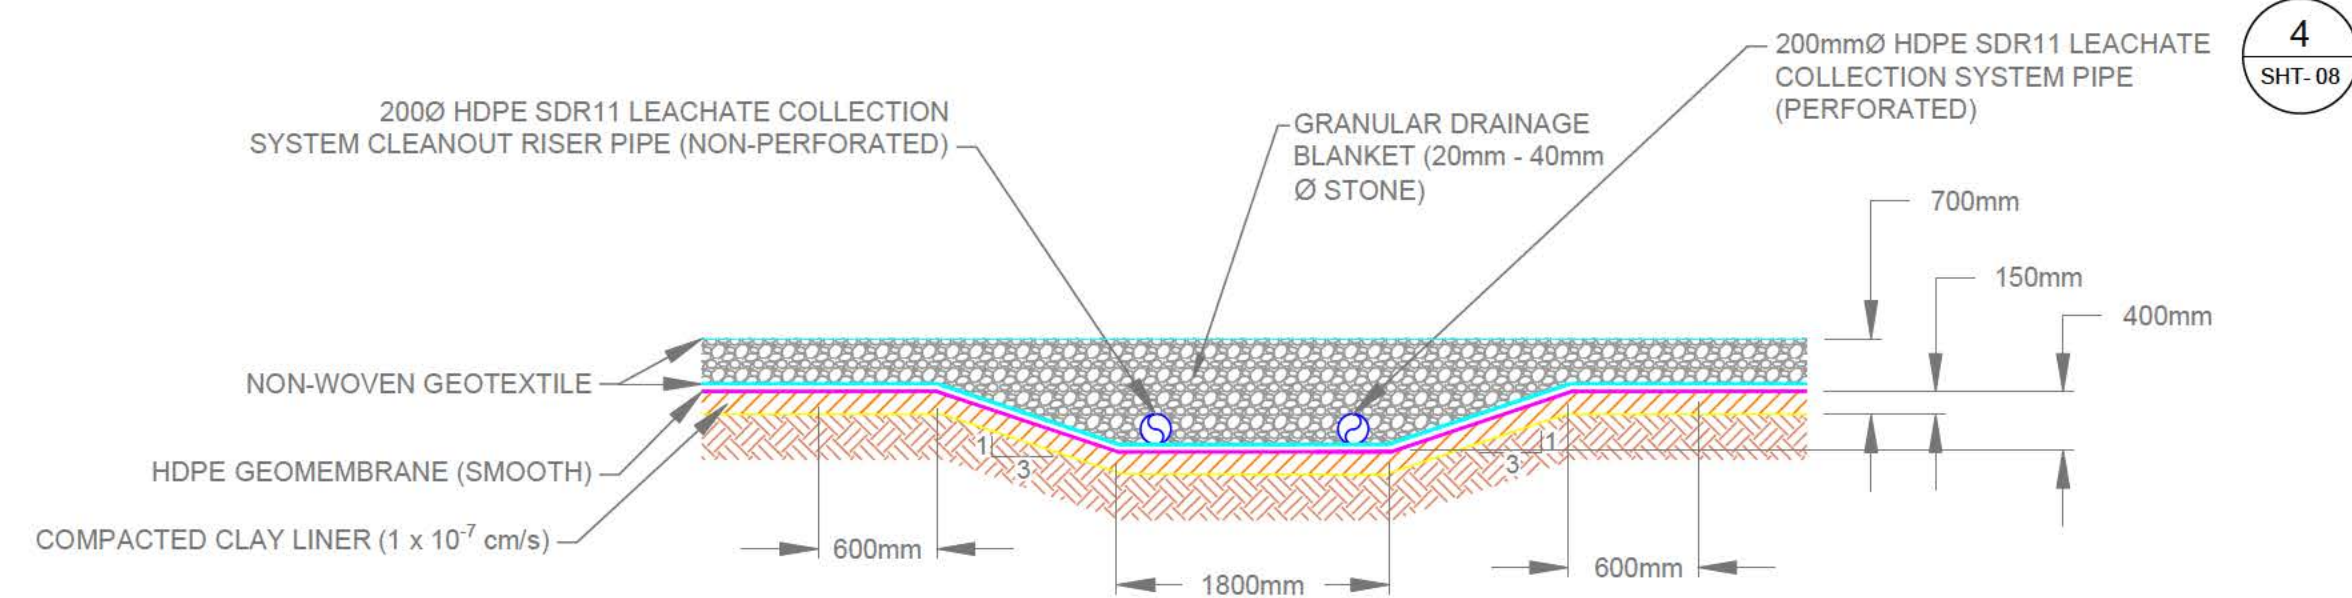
LEACHATE COLLECTION SYSTEM (TOE OF SLOPE)
